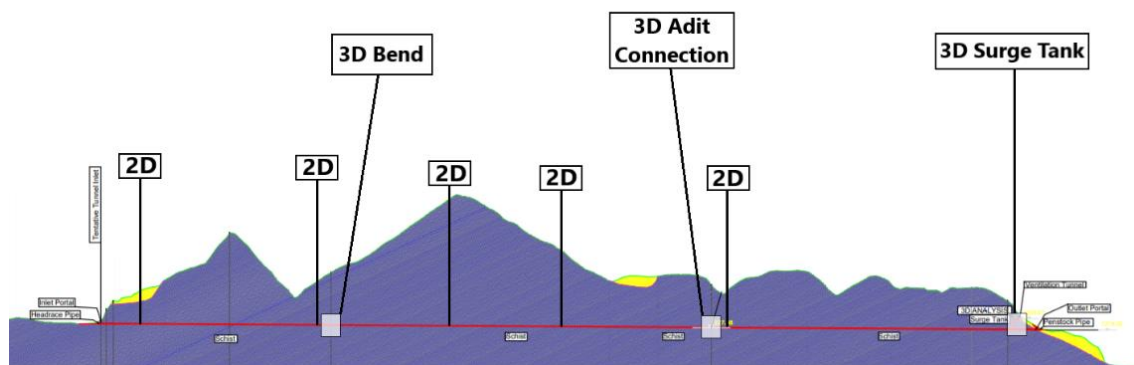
L-section of headrace tunnel showing 2D and 3D numerical modeling sections
